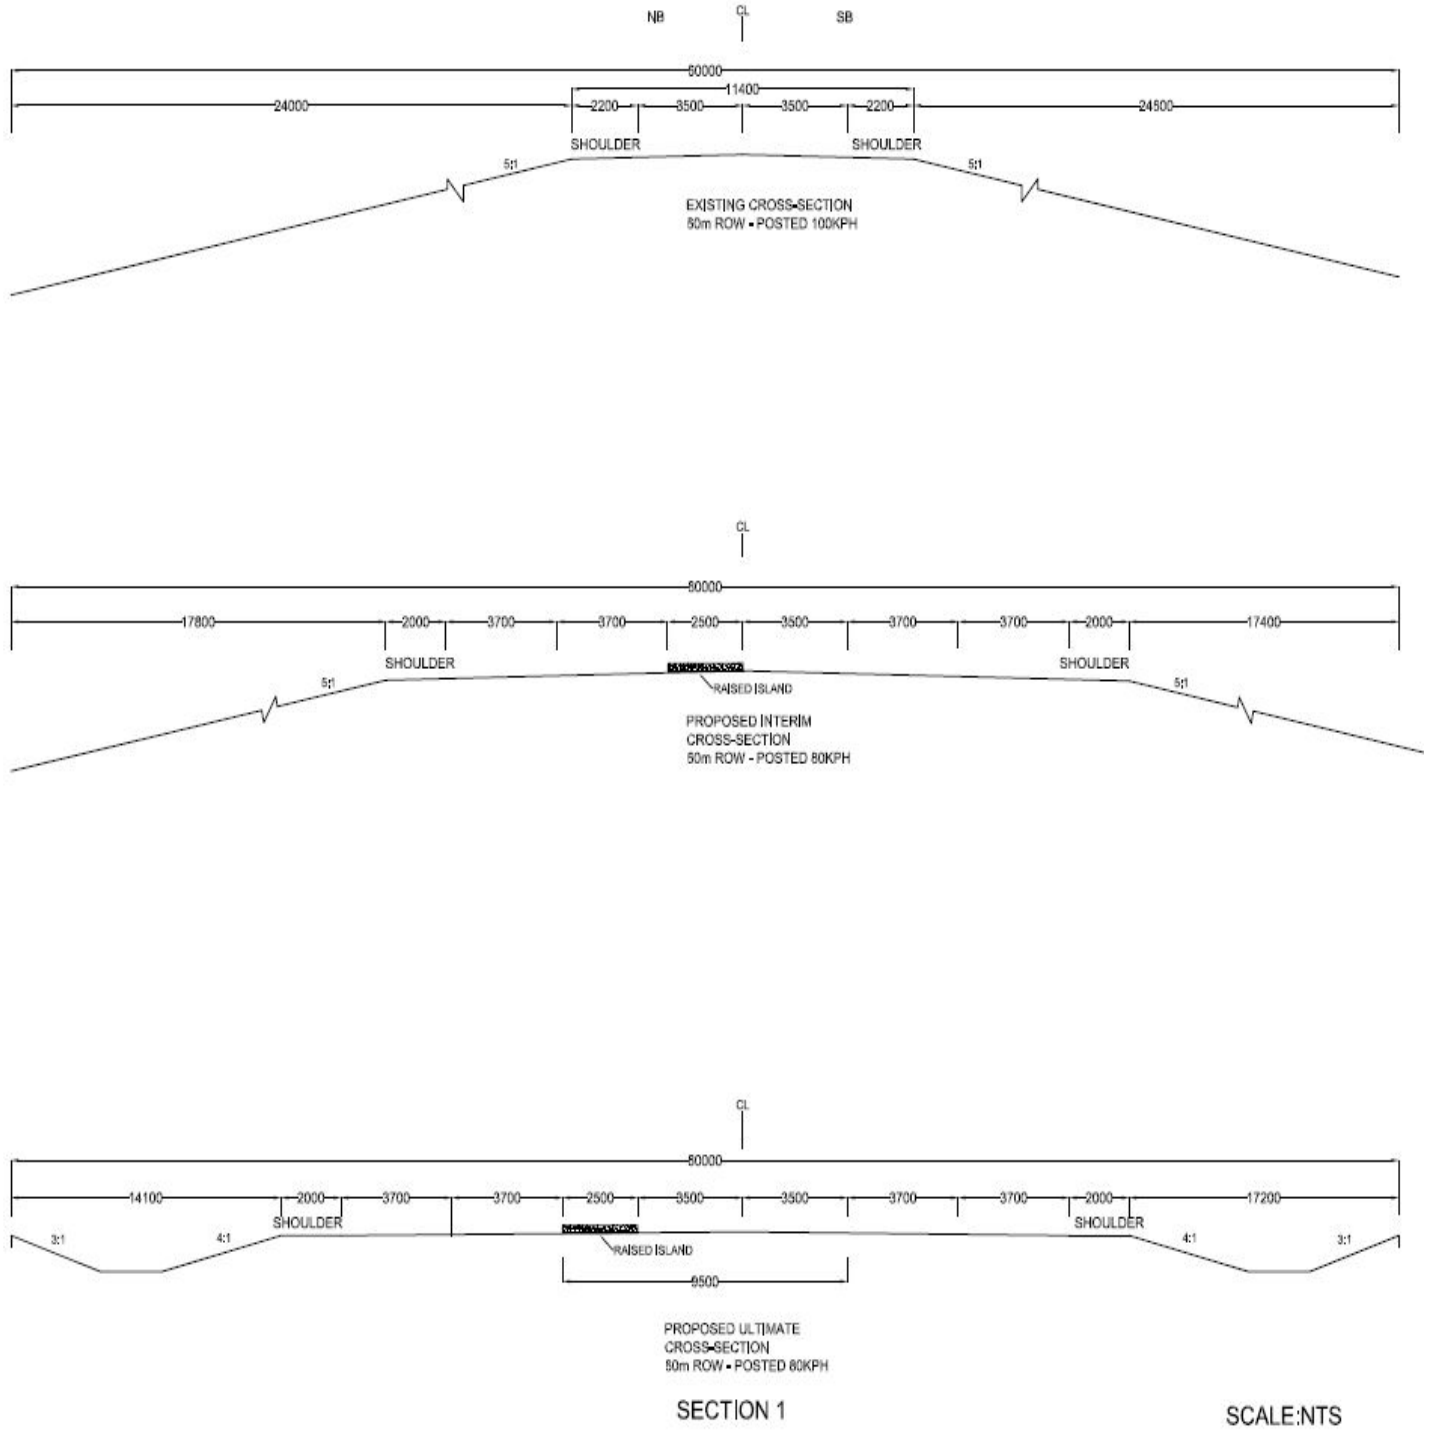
Proposed Cross Section 1 – Hwy 7 at RR 23
